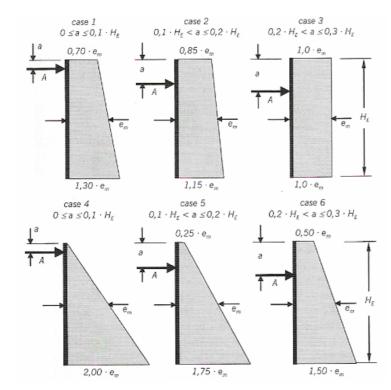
Earth pressure redistribution, (cases 1,2,3) trenching method in front of the wall, (cases 4,5,6) backfill behind the wall
